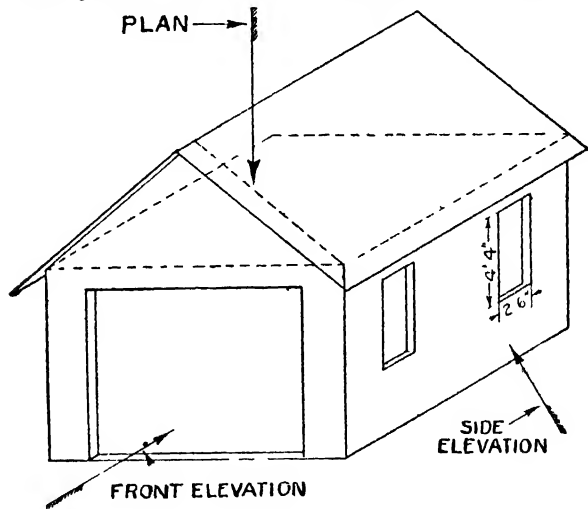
,333 — Cabinet projection of small garage, with arrow showing direction of sight for plan and elevations
